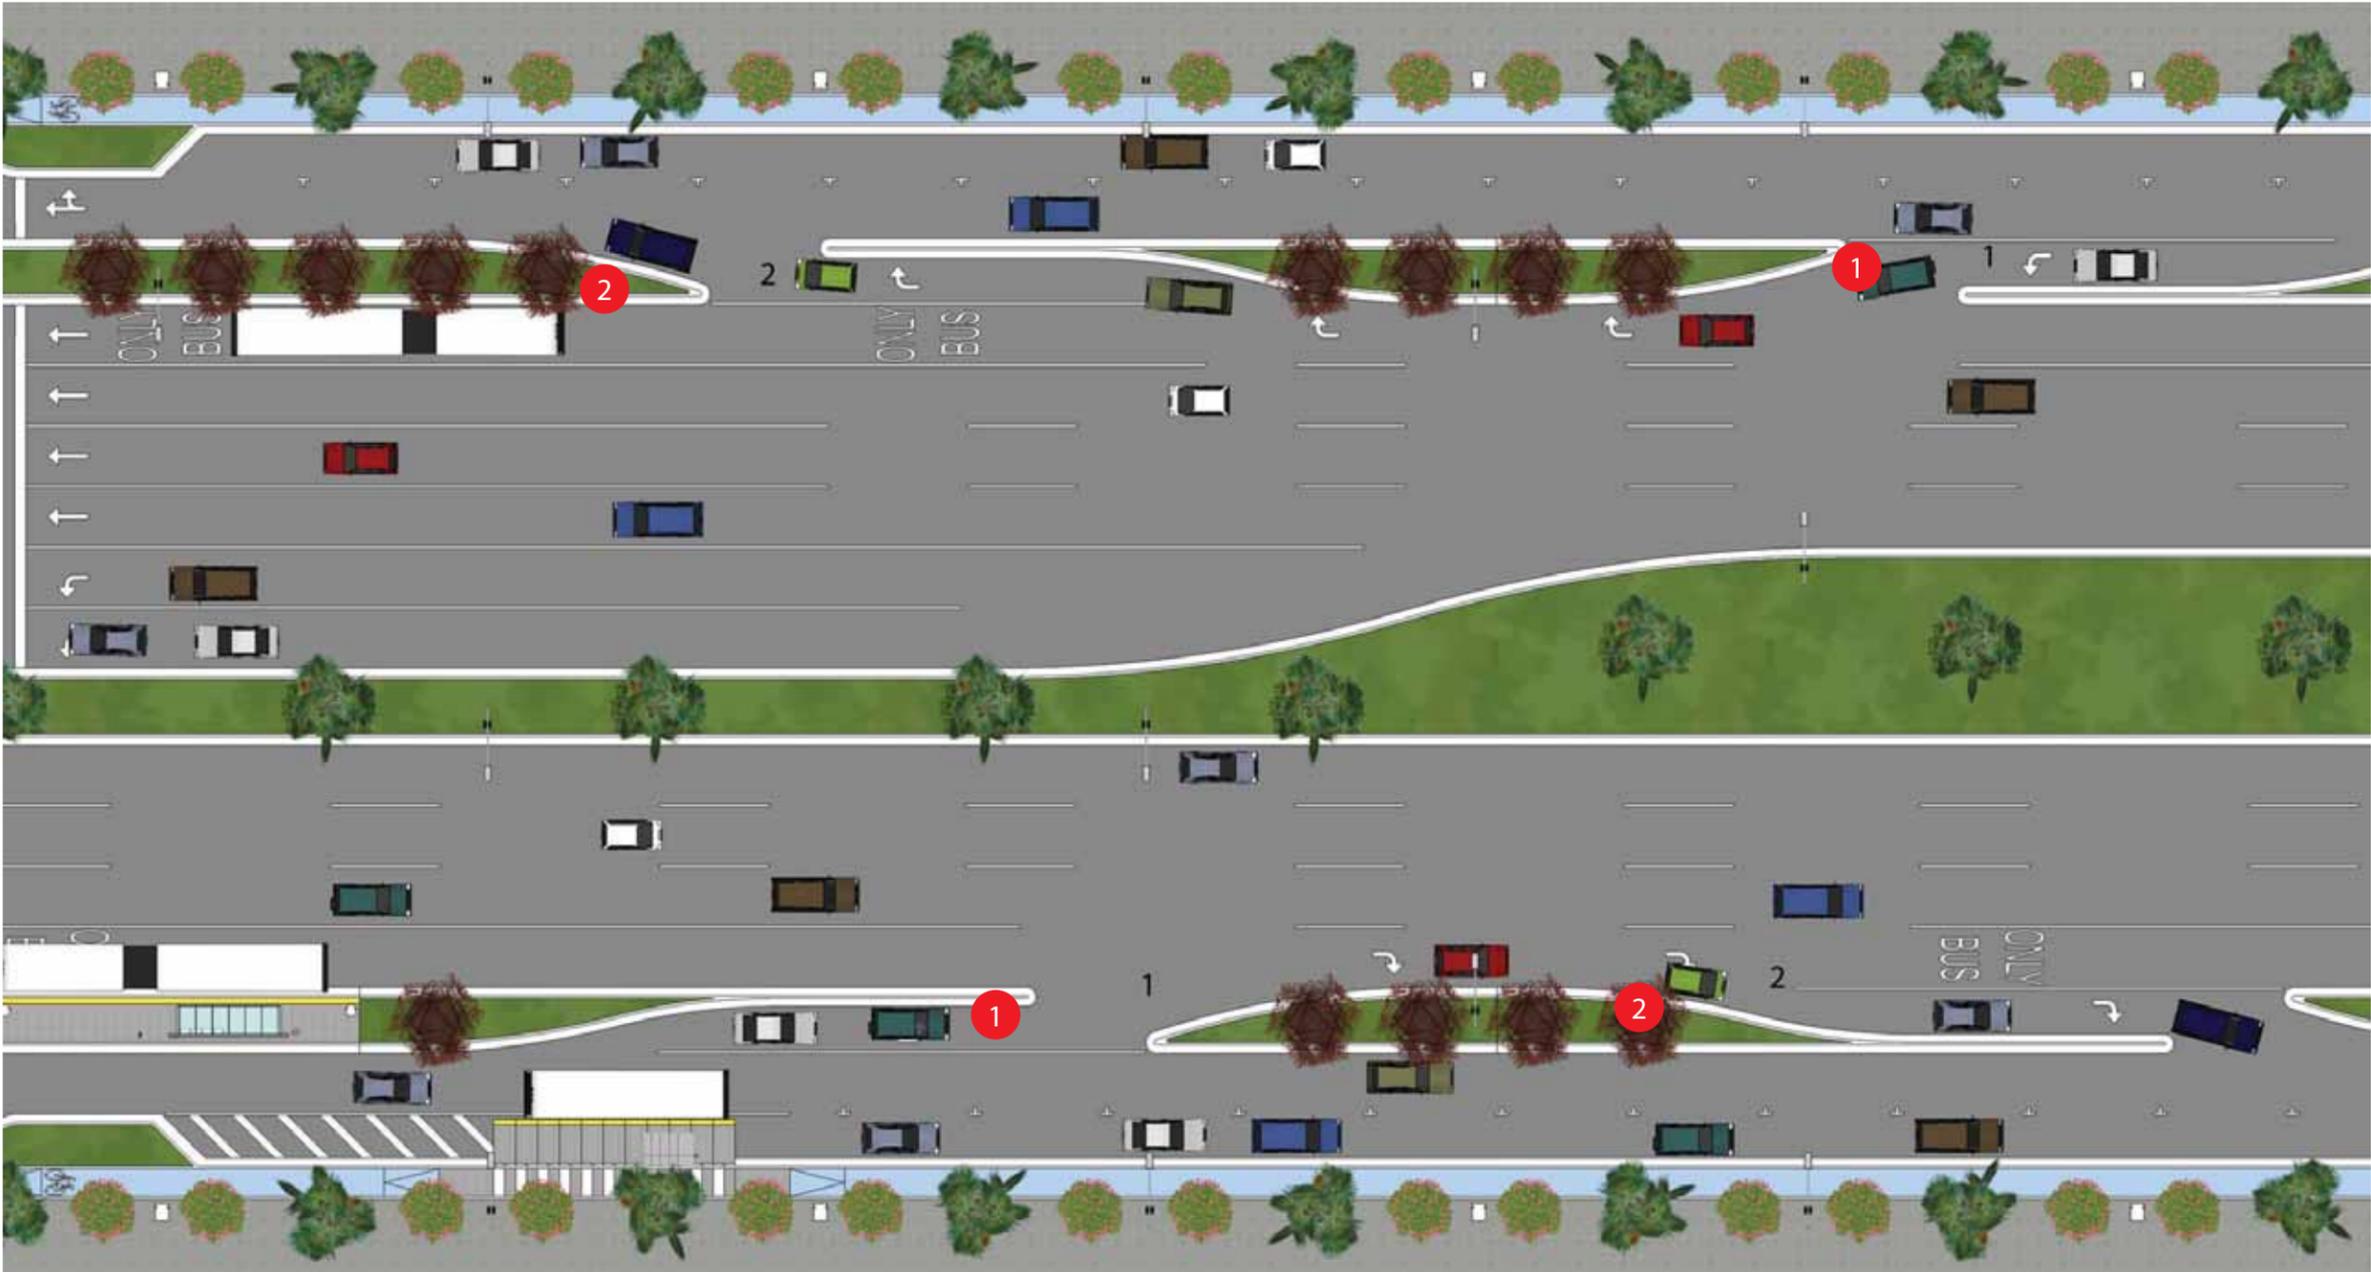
Concept plan showing cross overs from the multi-way boulevard to access lanes
